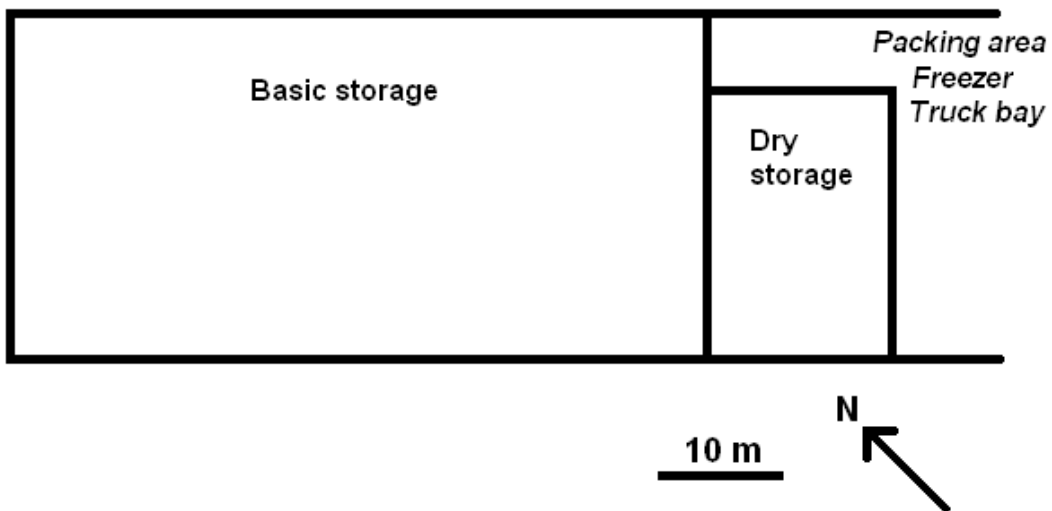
Floor plan (approximately to scale) of storage areas.
